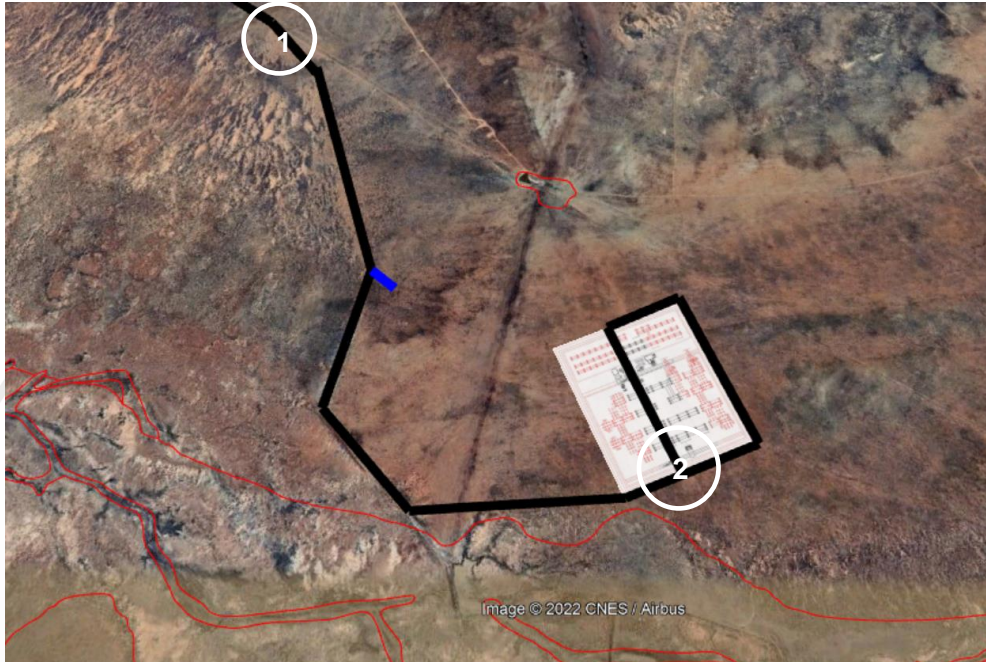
Section of new road from its intersection with the existing private road/farm track (1) to the Main Transmission Substation MTS (2). A short access road to the Switching Station (Dx) will also be developed (blue line). Red lines indicate flood plain soils (possible watercourse).
